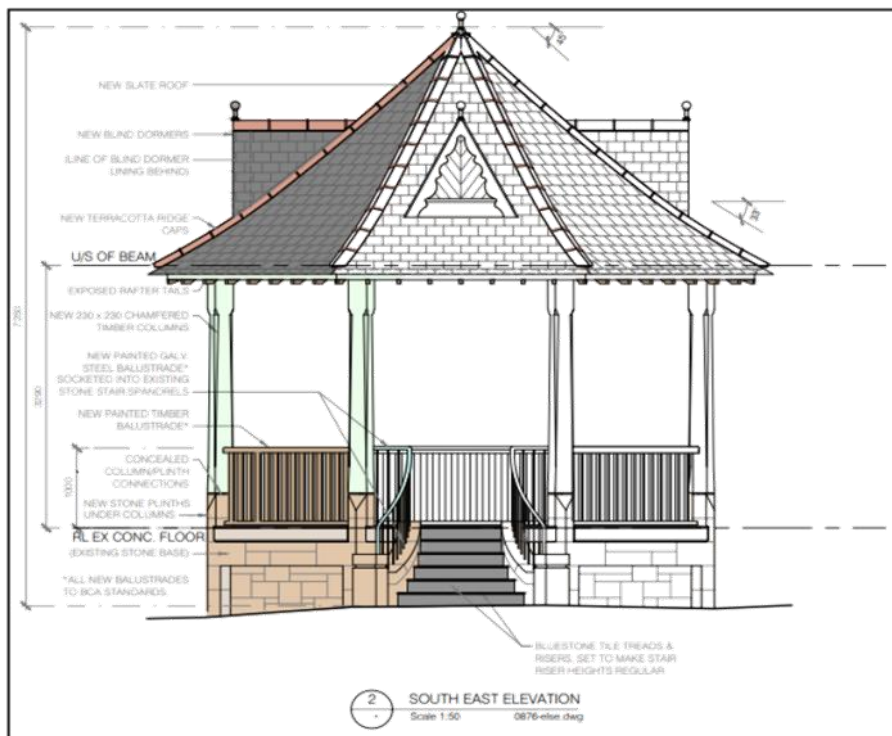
South East Elevation. Source: Hector Abrahams Architects
